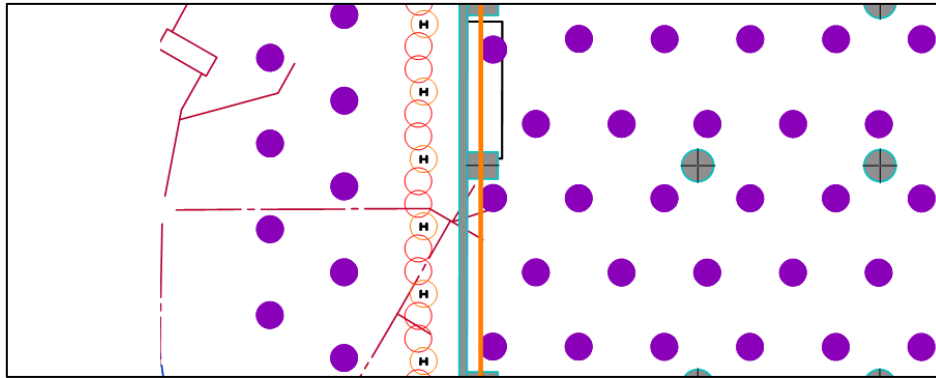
DSM columns layout showing the secant DSM wall with vertically reinforced piles slightly offset and the grid pattern inside the basement and around the perimeter to provide ground improvement and liquefaction mitigation.
